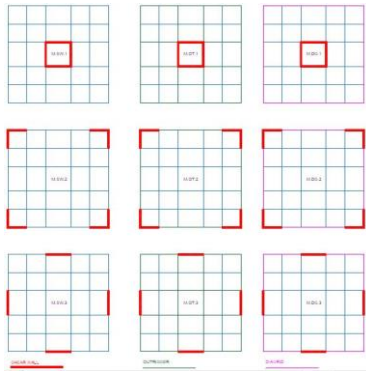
Plan Layout to Illustrate the Location of Shear Wall, Outrigger and Diagrid
